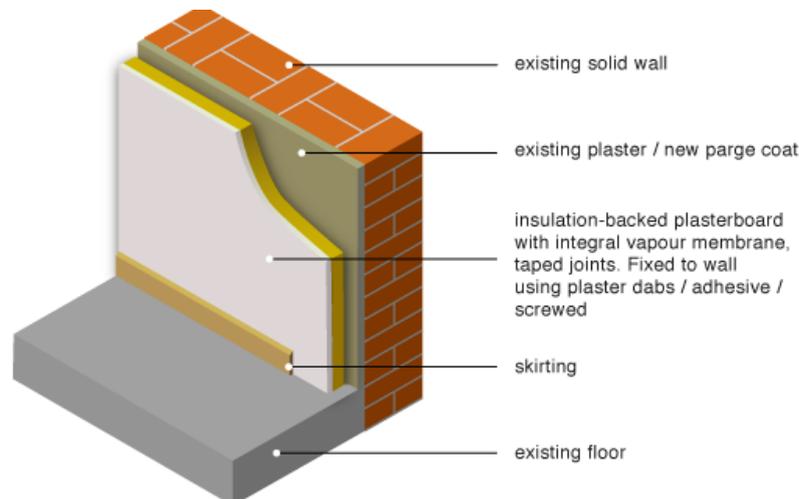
Plasterboard laminated fixed to the existing wall <sup>[13]</sup>
